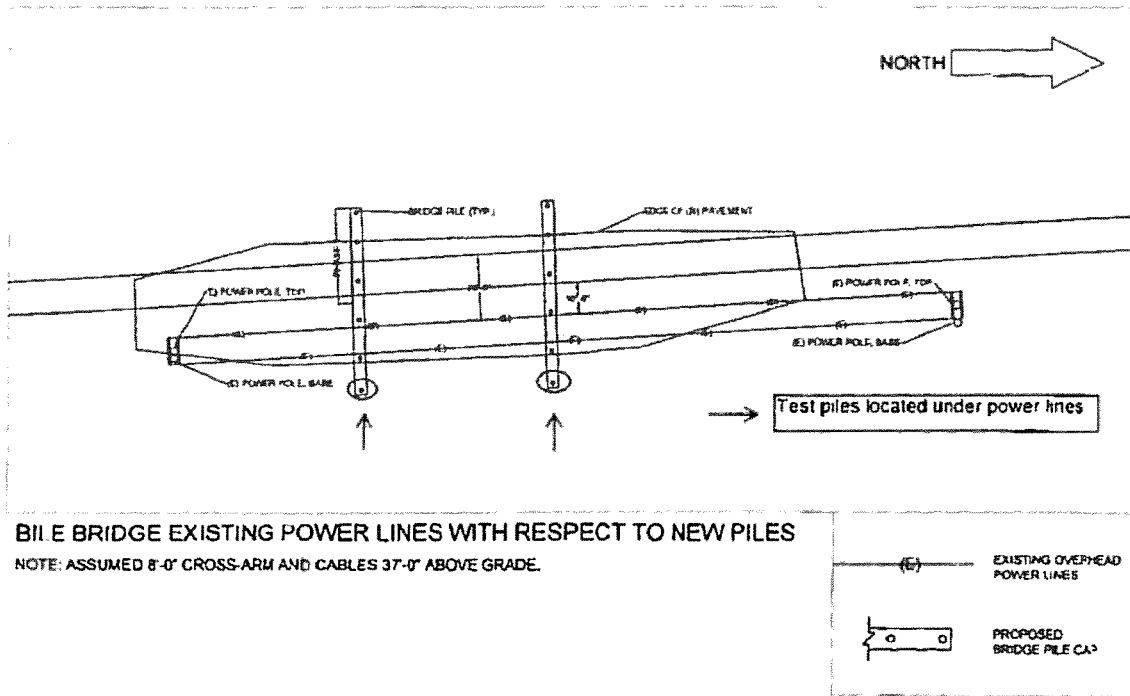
Existing Bile Bridge Overhead Electrical Line (Plan)
